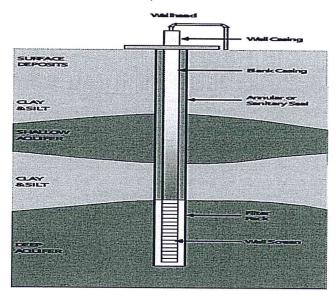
Schematic Drawing Showing Completed Well (DWR)
